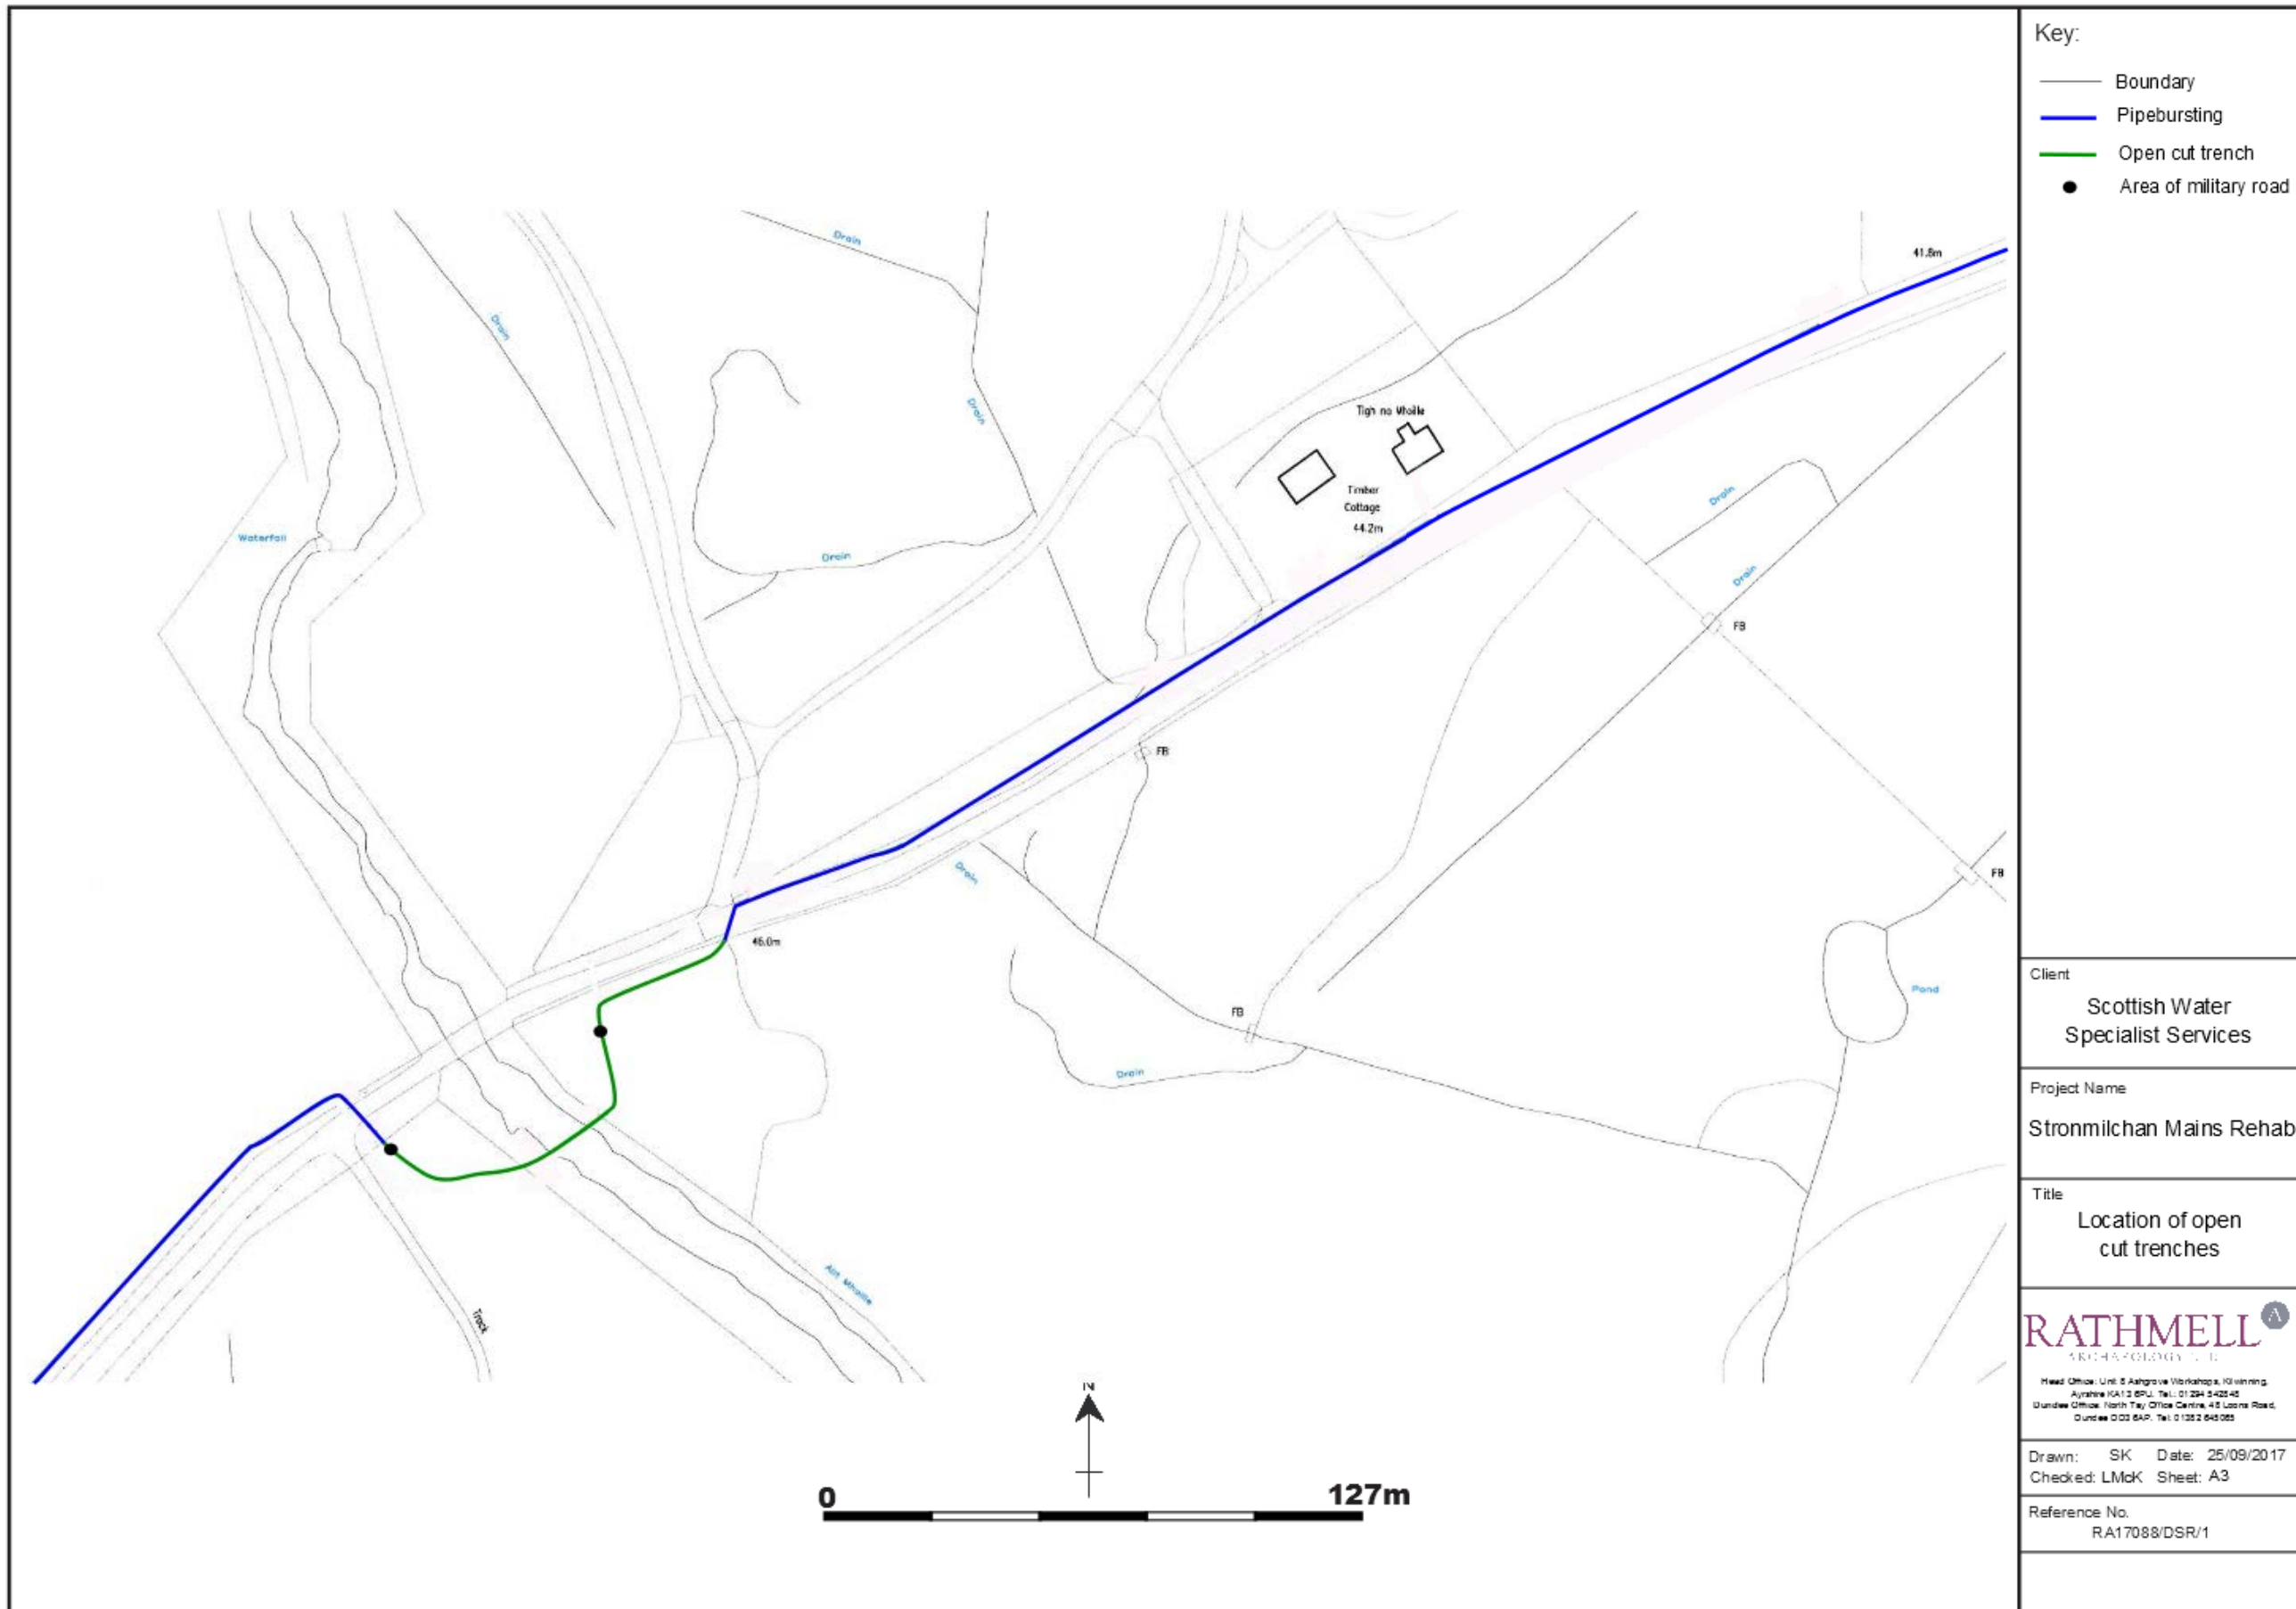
Plan of site showing location of open cut trenching, after plan by Scottish Water
